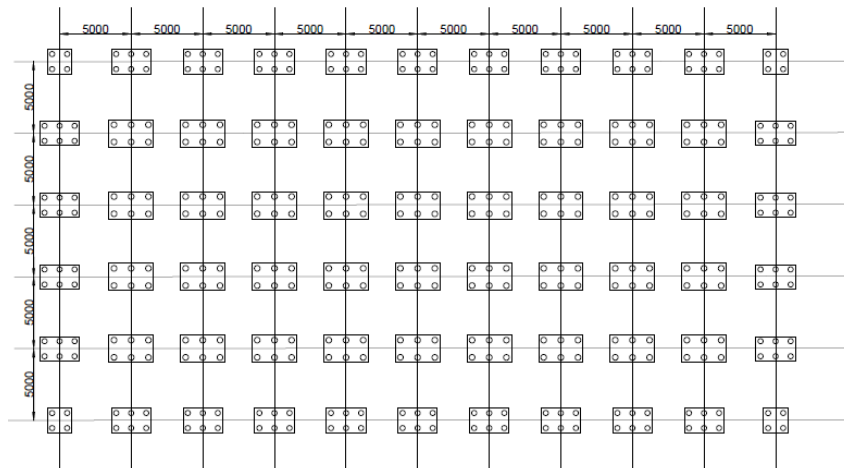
Arrangement of Group Piles according to the building's floor plan
